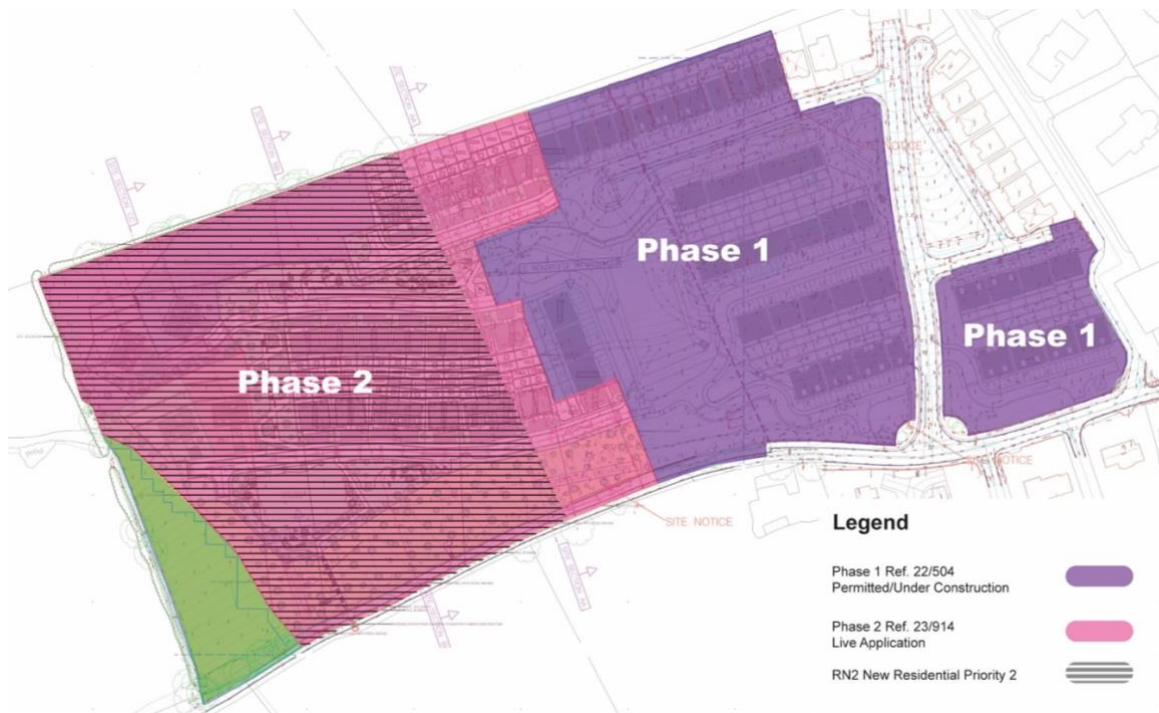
Site Layout submitted at FI under Ref. 23/914 (Phase 2 shown highlighted to the south of the overall site)
